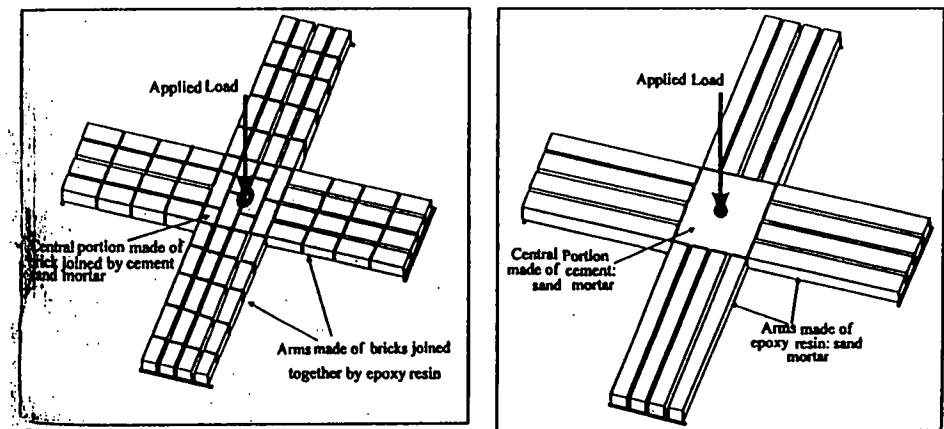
a) Masonry Cross Beams, b) Mortar Cross Beams.
